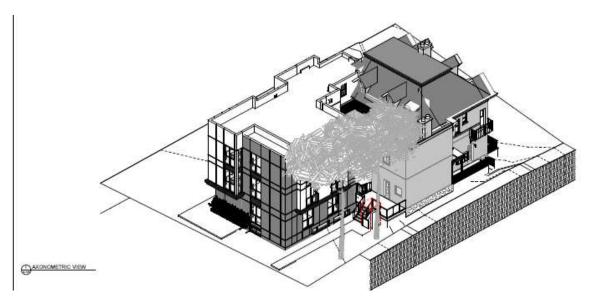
South-West facing view showing the East Elevation of the Rear Addition.
